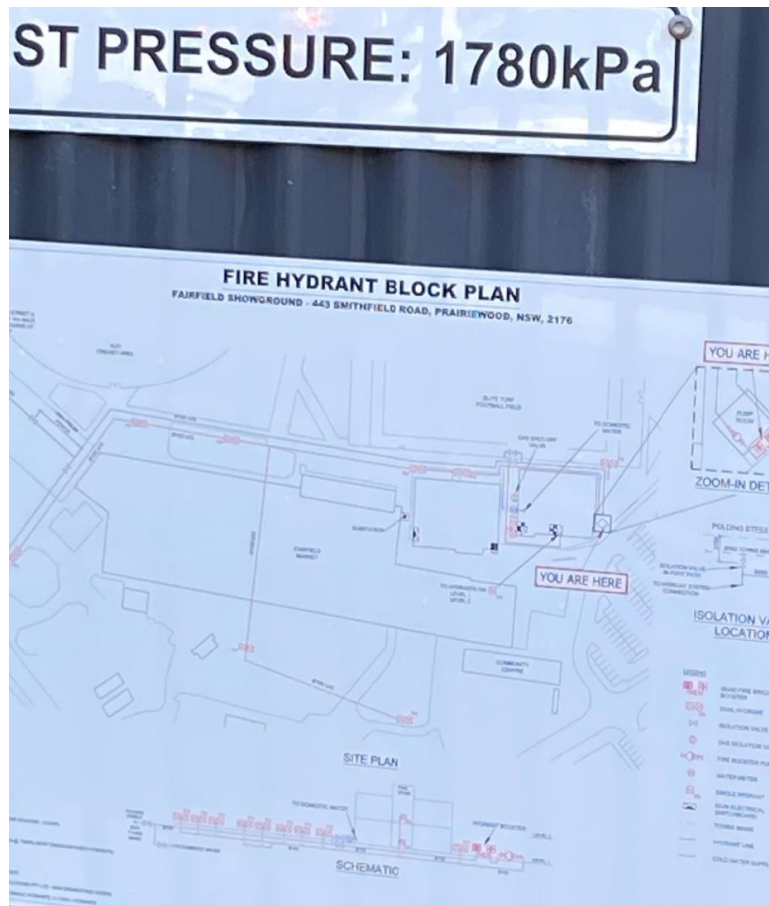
Existing Fire Hydrant System Block Plan for Grandstand
